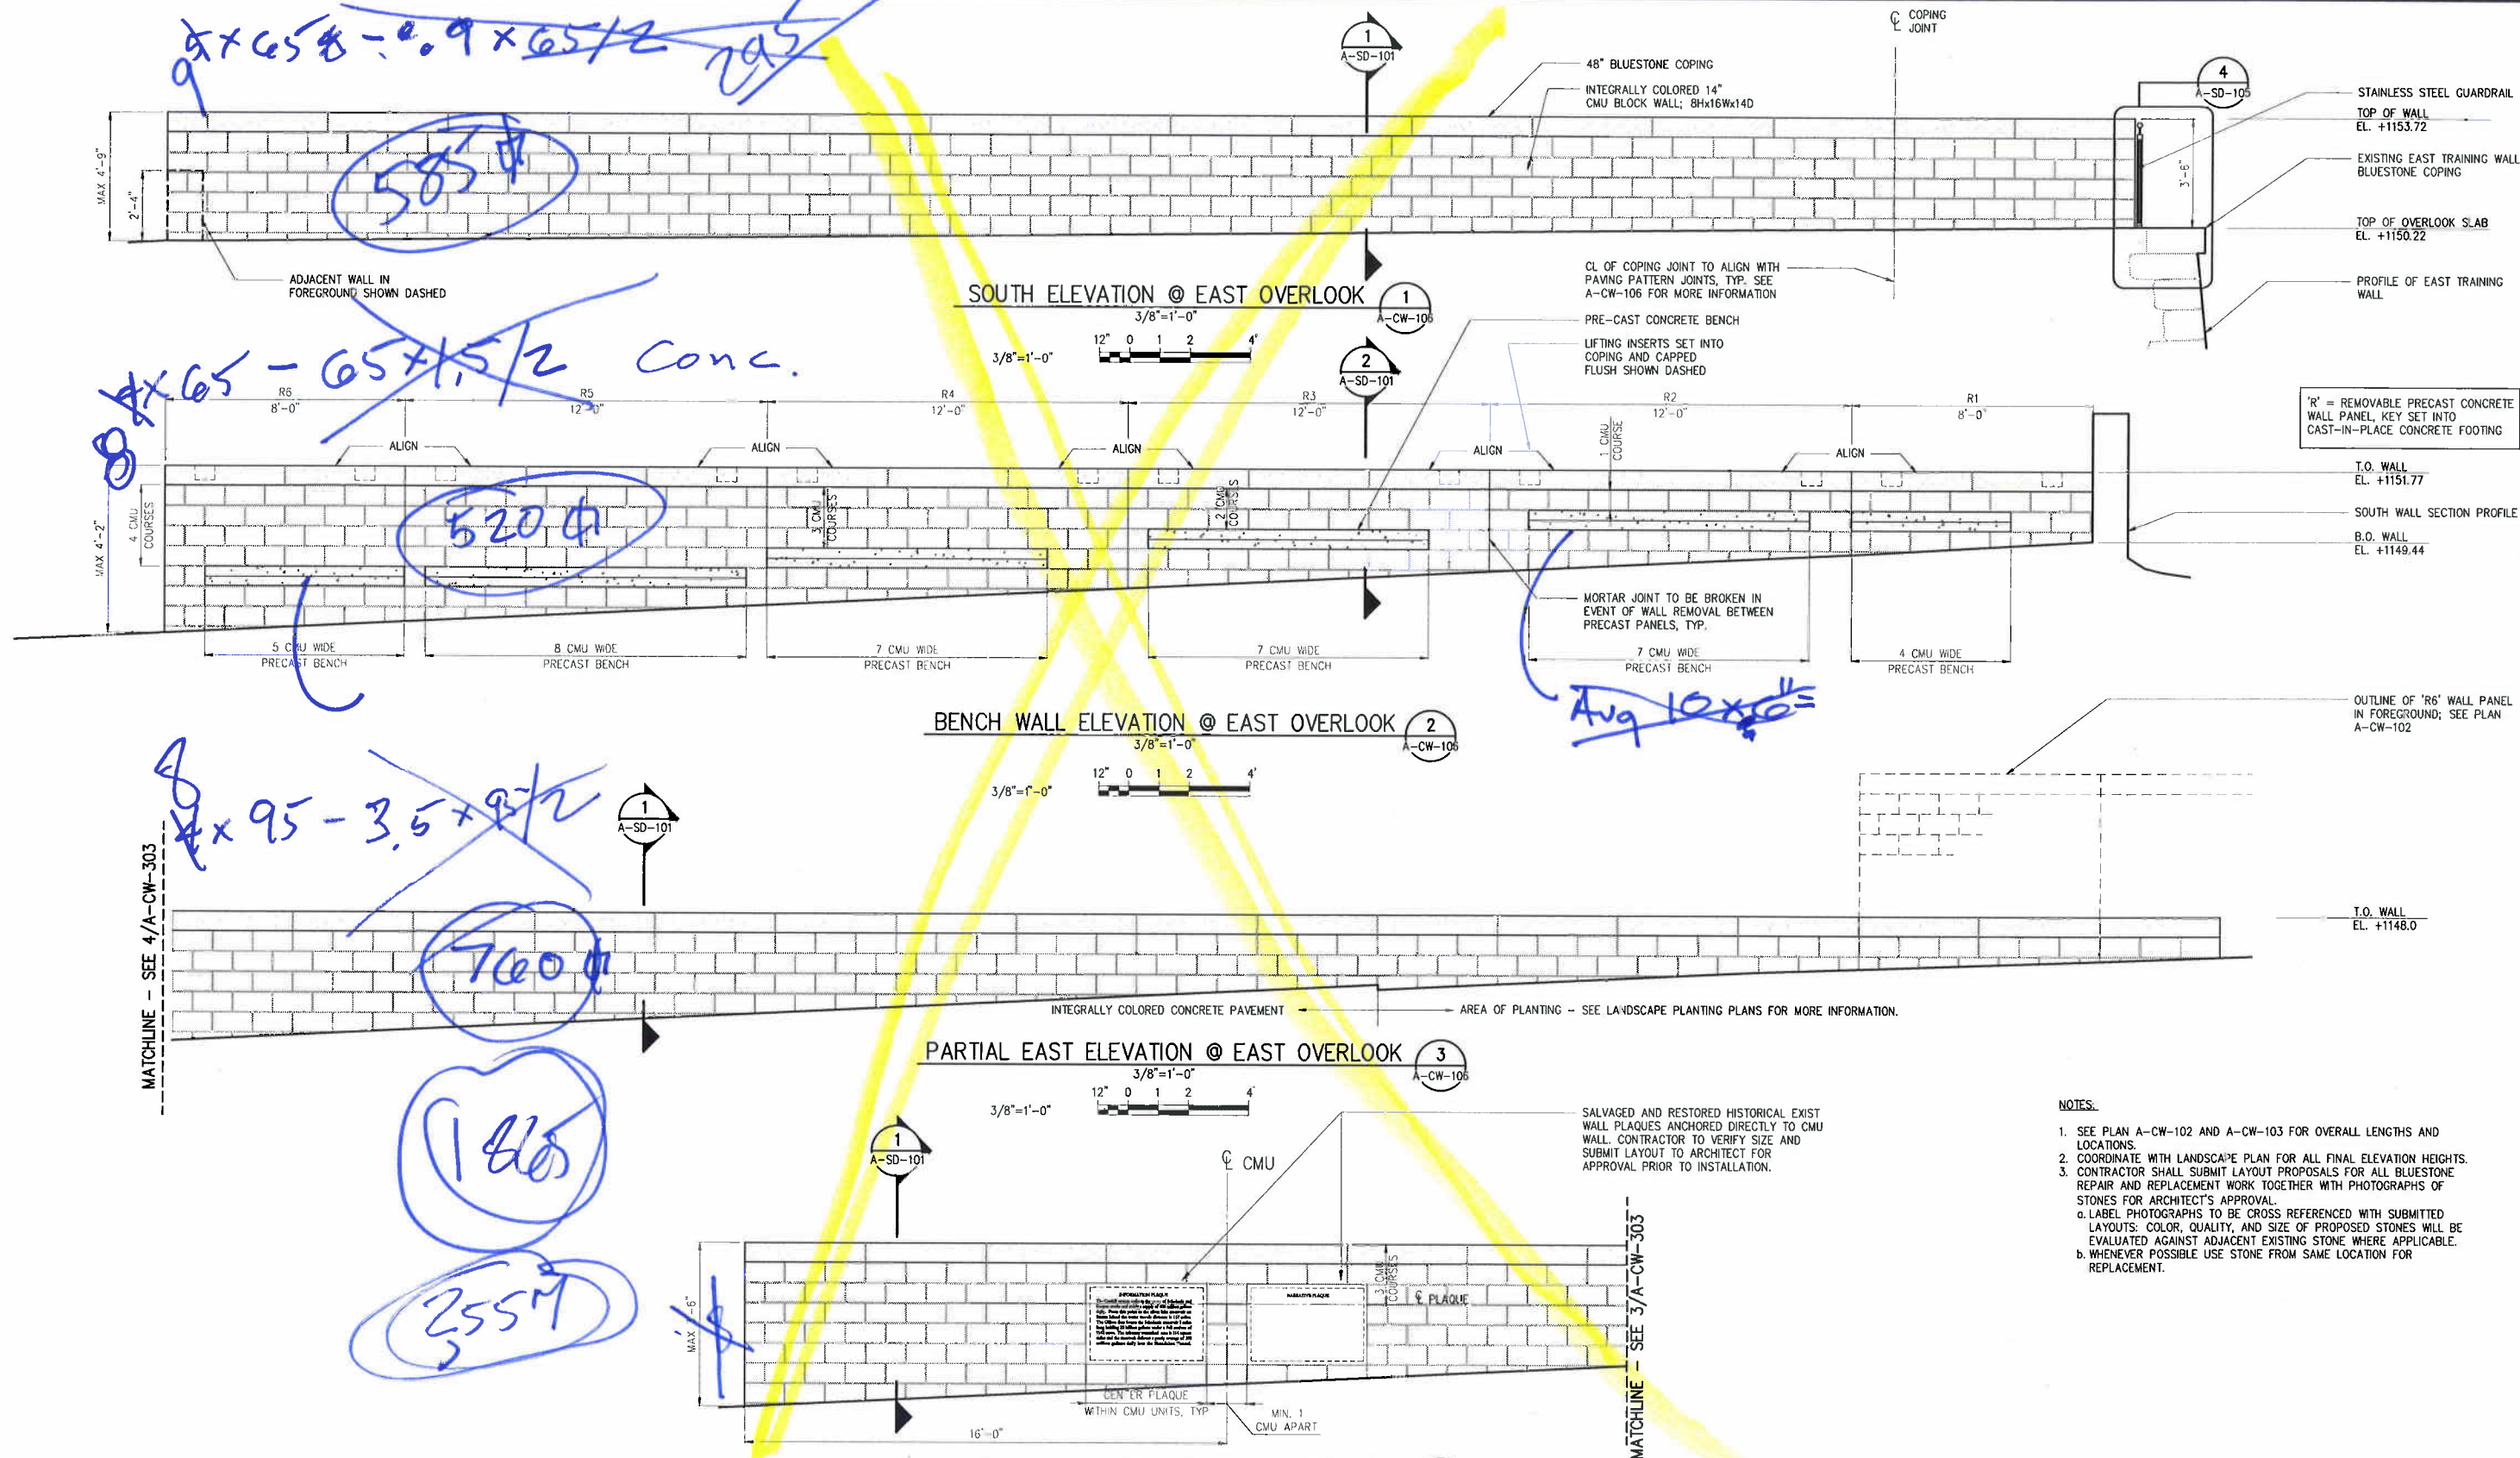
DETAILED EAST OVERLOOK ELEVATIONS - SHEET 1 OF 2
